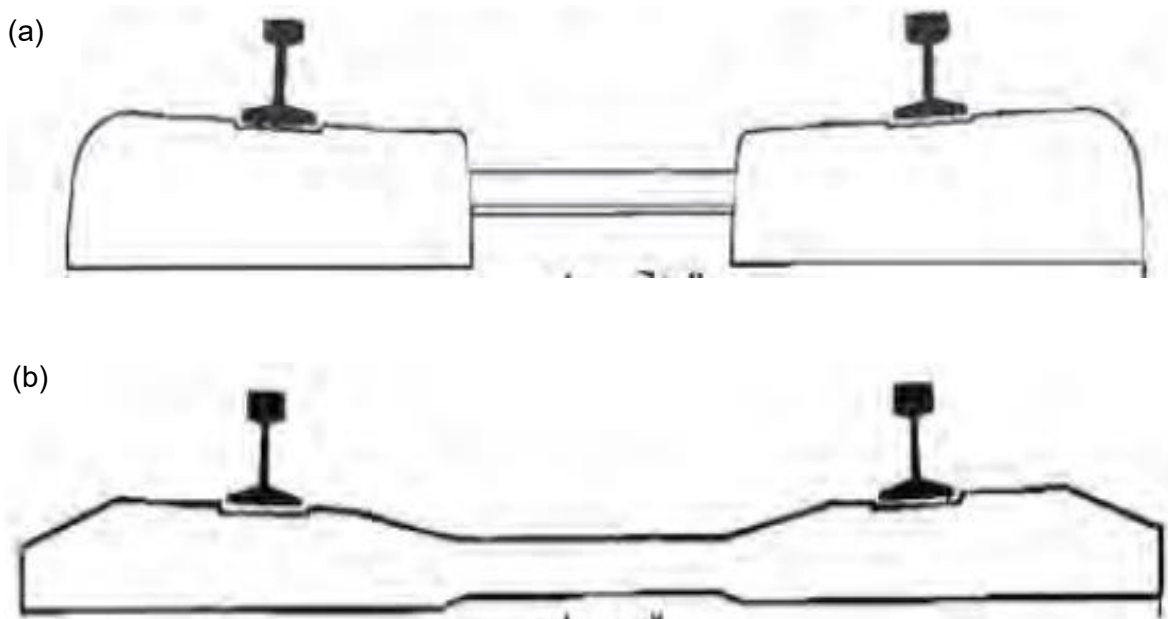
(a) Twin block concrete sleeper sonneville design (b) Monolithic concrete sleeper stupp design (Hay, 1962)
